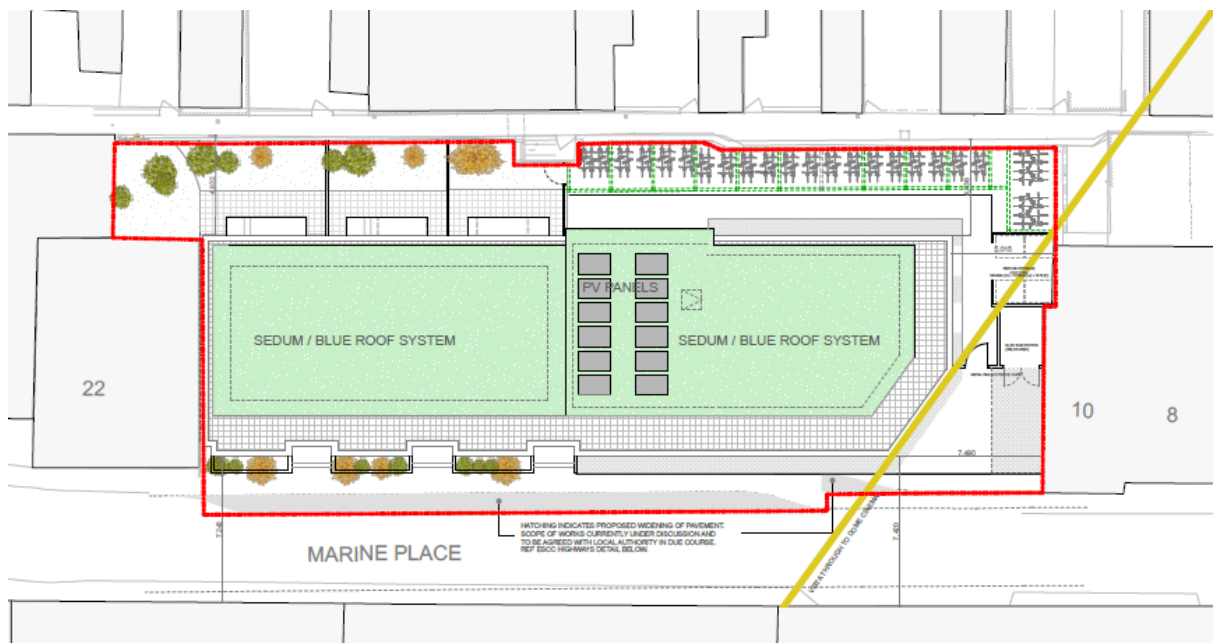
Proposed Site Plan (yellow line showing view towards The Dome)
